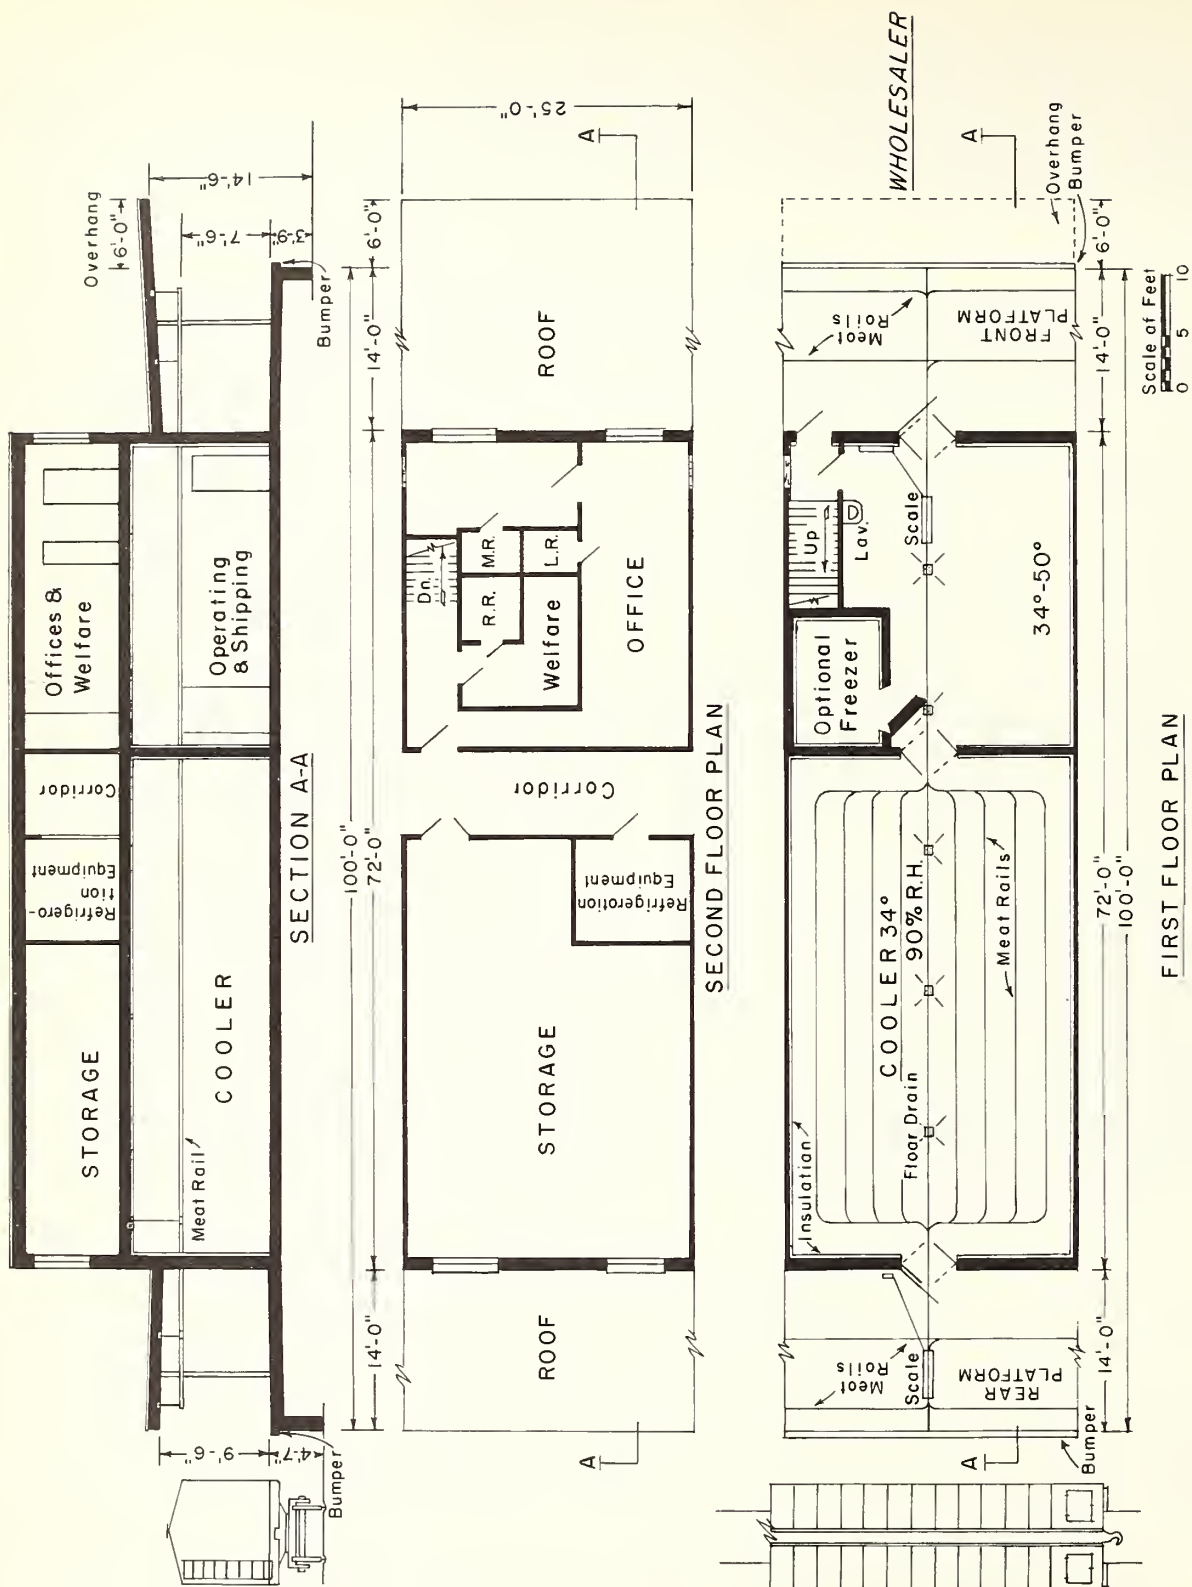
A plan for a meat wholesaler's single unit. A cross section and a layout of second floor.
